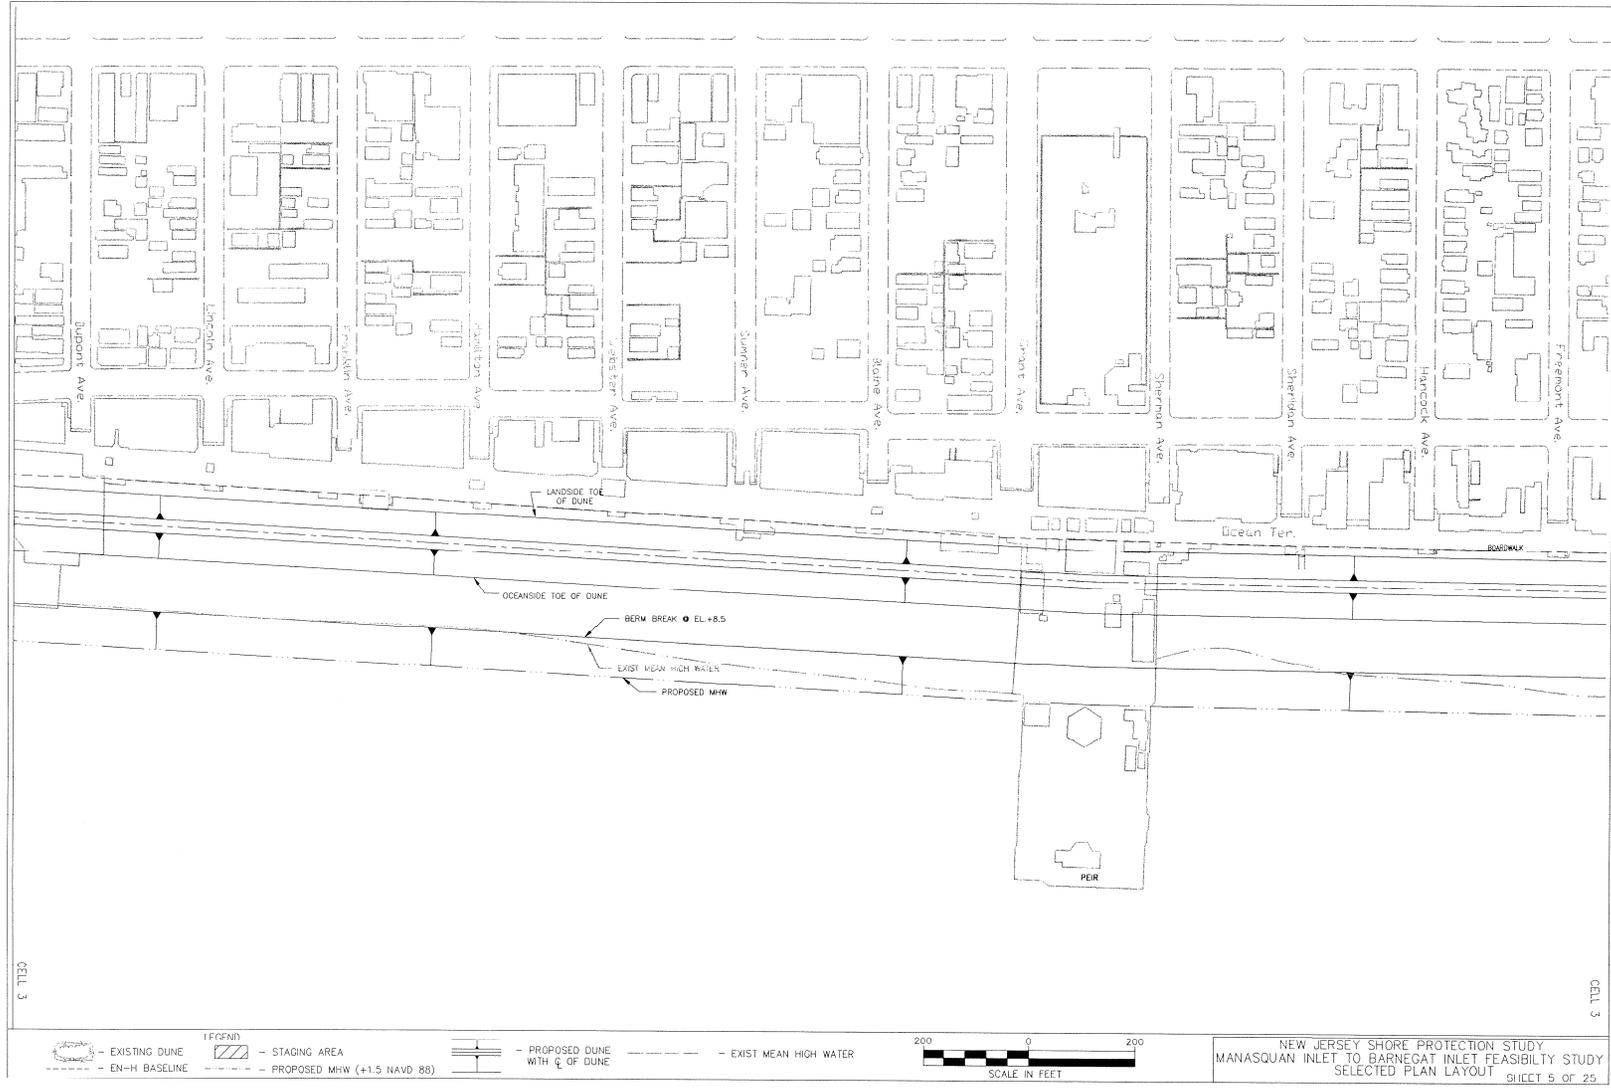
Selected Plan Layout – Seaside Heights Borough, Dupont Avenue to Freemont Avenue
